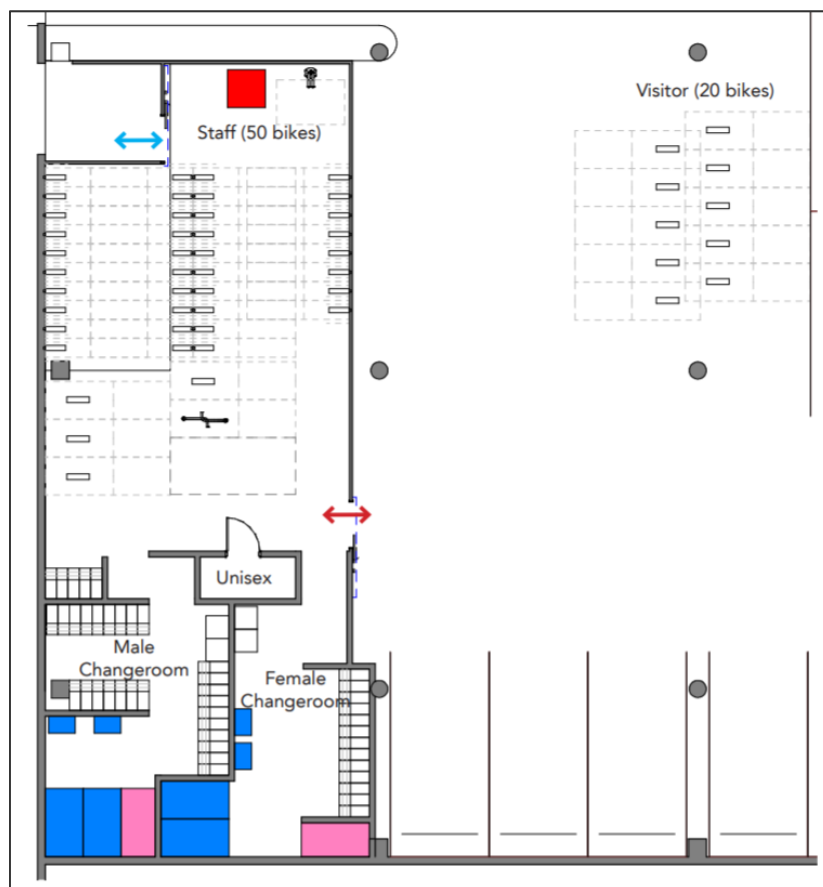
| Proposed bicycle parking and end-of-trip facility design
